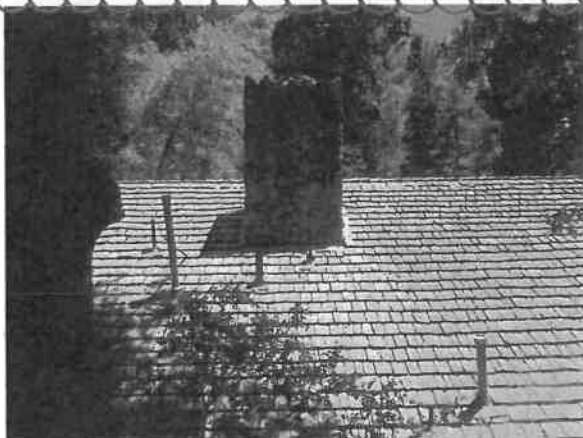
The chimney above the roof should be braced to prevent toppling in an earthquake.
